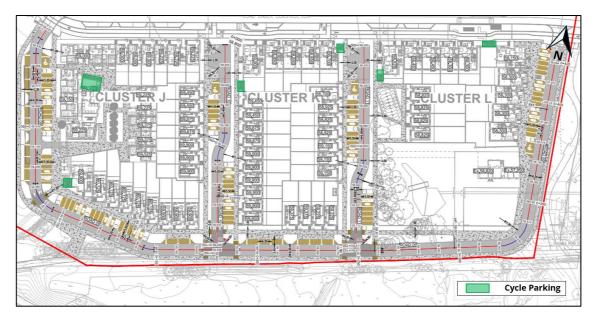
Site 4 Cycle Parking (South of Link Road)
